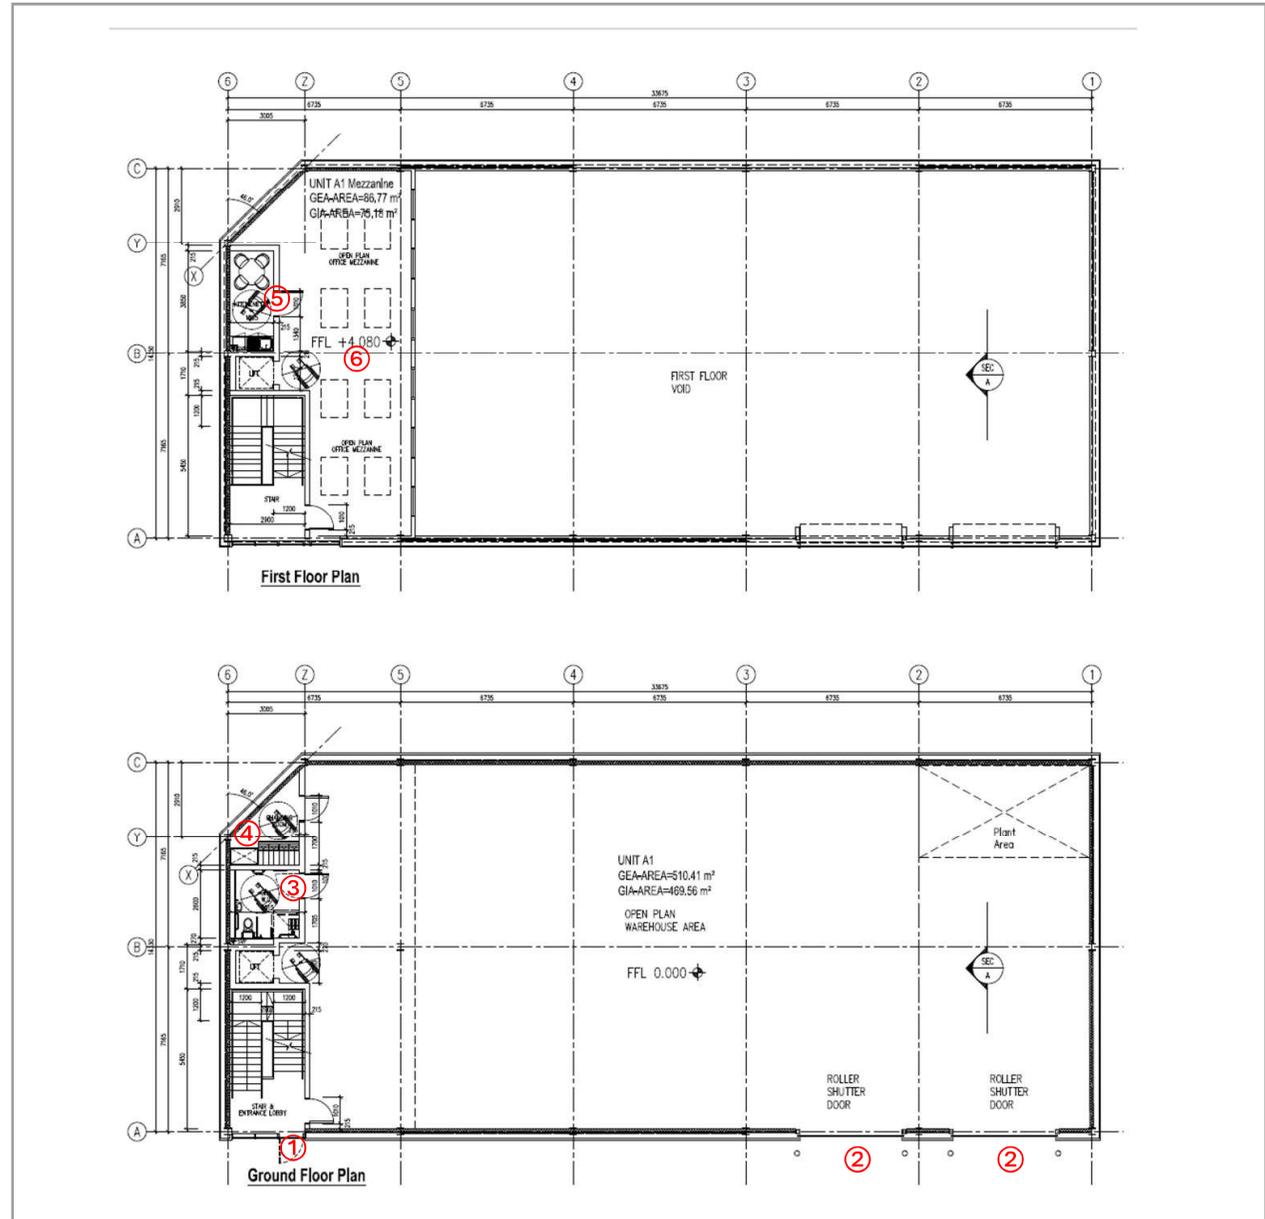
A Unit A1 Floor plans (extract from Drg. No. 122016 P100 - P04)
